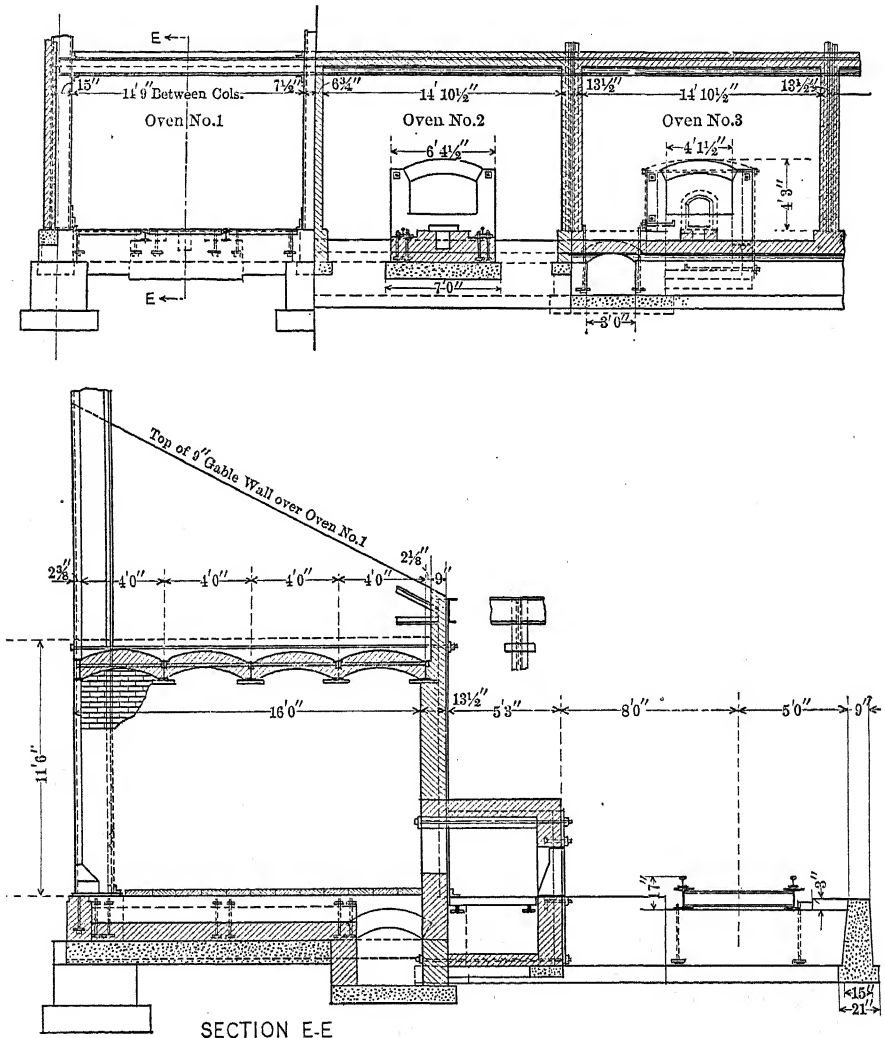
ELEVATION AND SECTION OF BOTTOM OVENS, BETHLEHEM STEEL CO.
